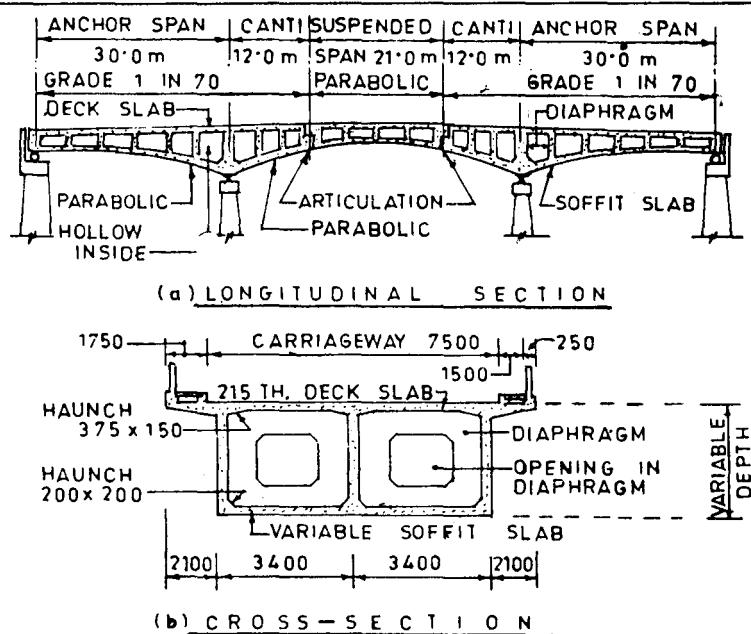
DETAILS OF HOLLOW-BOX GIRDER ( Ex. 11.1 )
